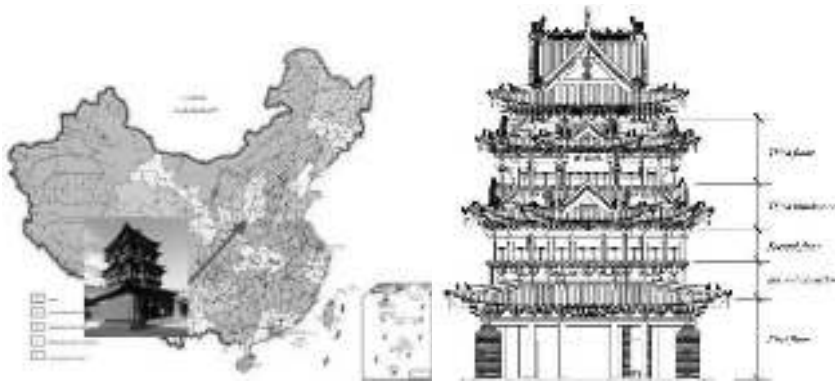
The geography location and elevation drawing of Feiyun Pavilion
